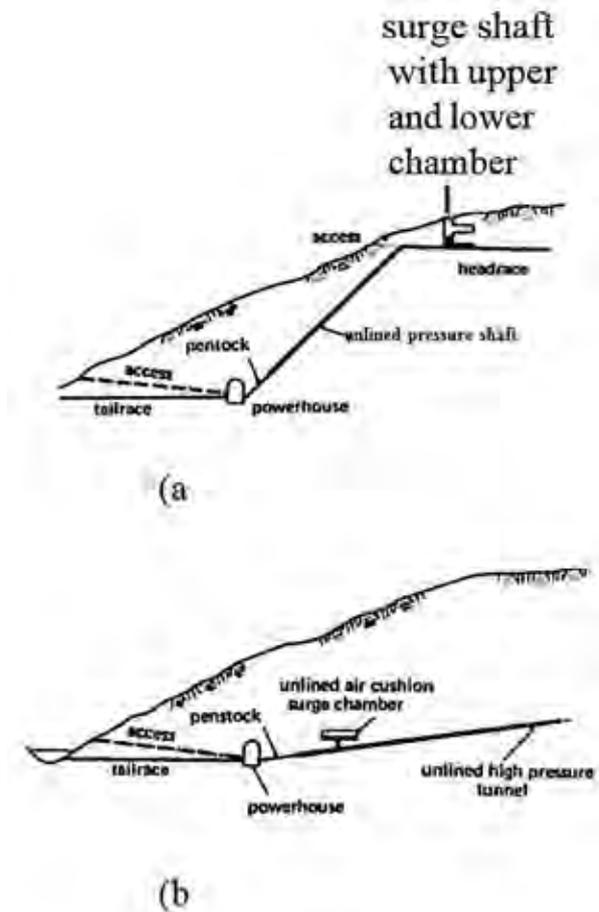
Comparison of layouts for underground plant using: (a) open surge shaft; and, (b) closed air cushion surge chamber.
